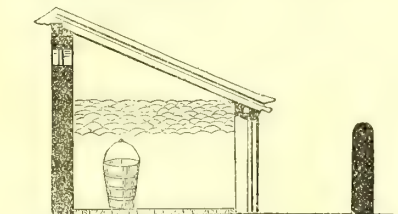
LAVATORY AND BATH ROOM, JAULNAH,
